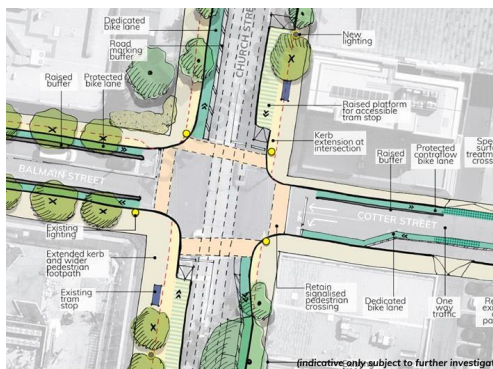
Hotspot 4 - Balmain Street, west of the underpass
